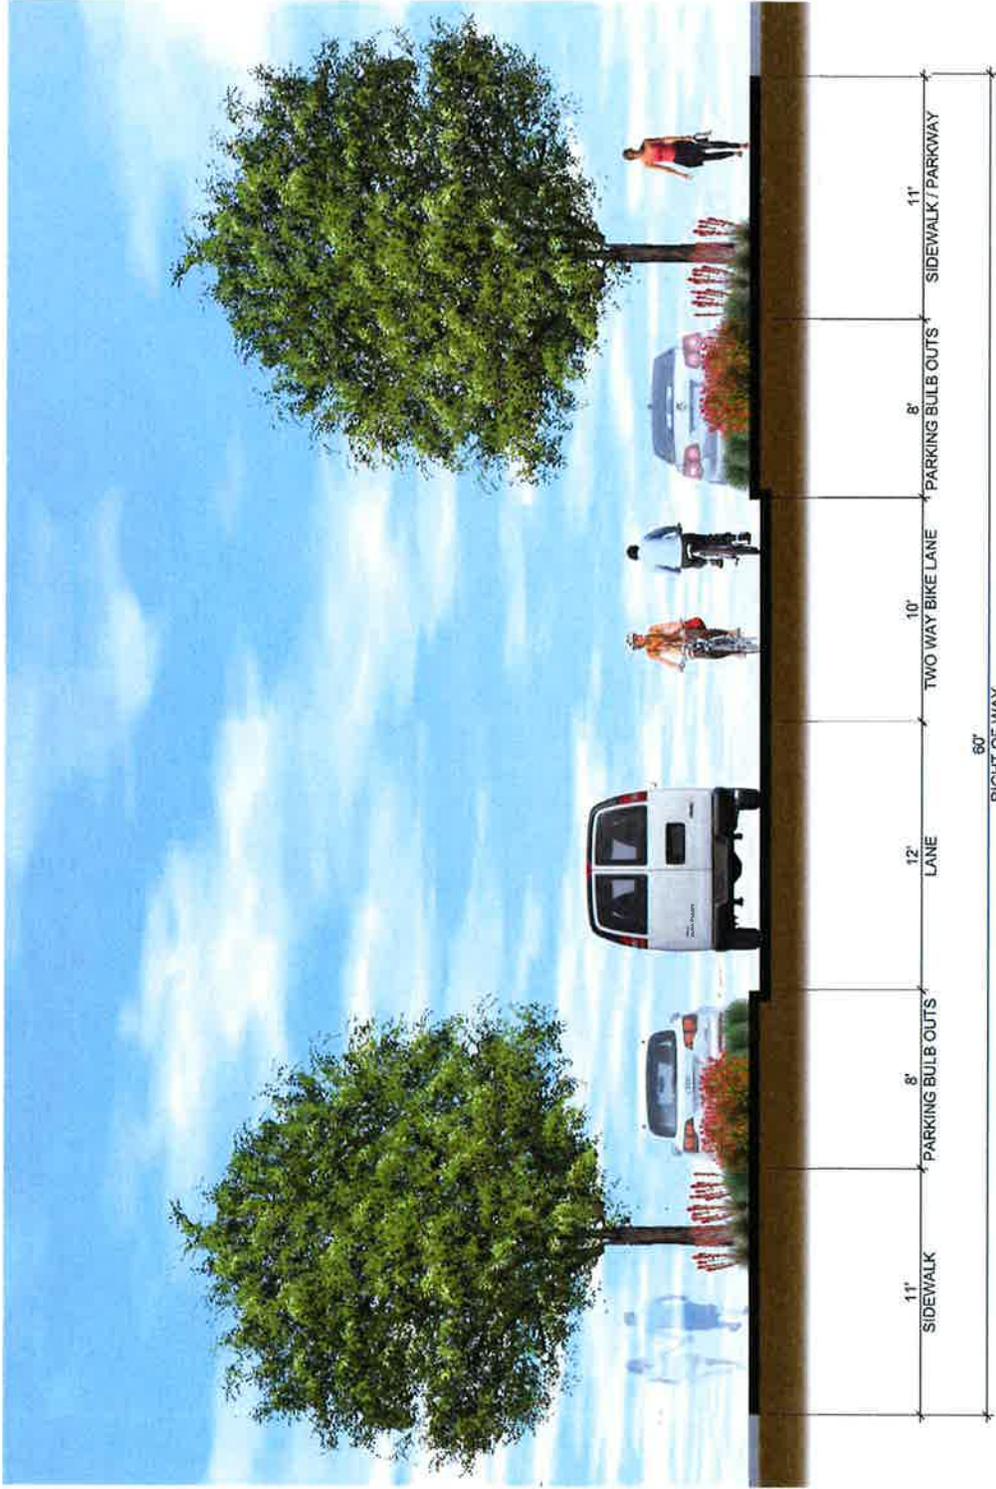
Bradford Avenue Looking Southbound from Center Street Cross Section
